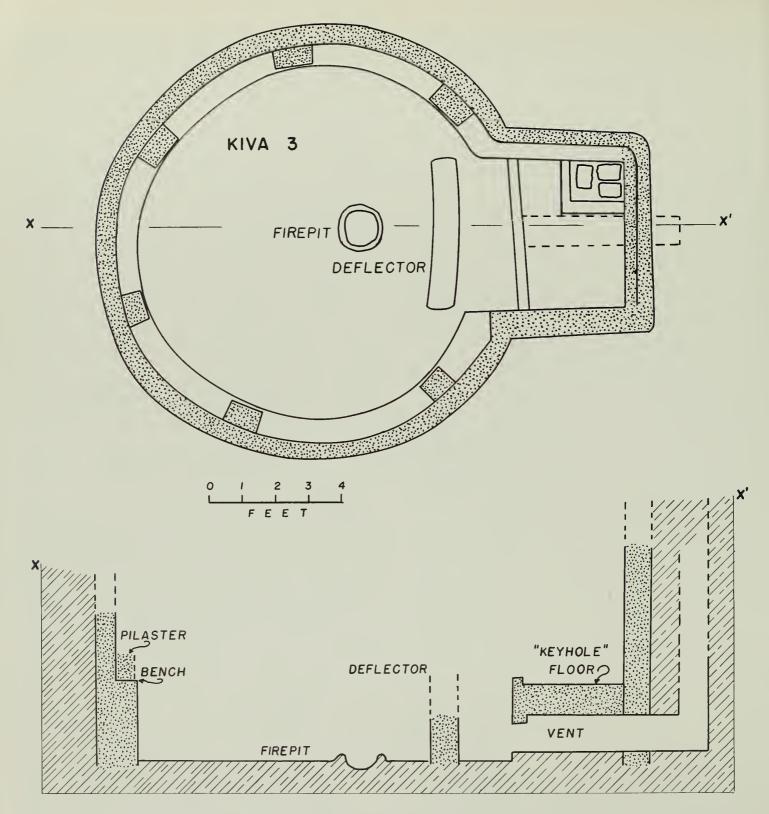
Plan and profile of Kiva 3 below Tri-wall Rooms 4 and 5. Construction is adobe reinforced with small rods or limbs.
